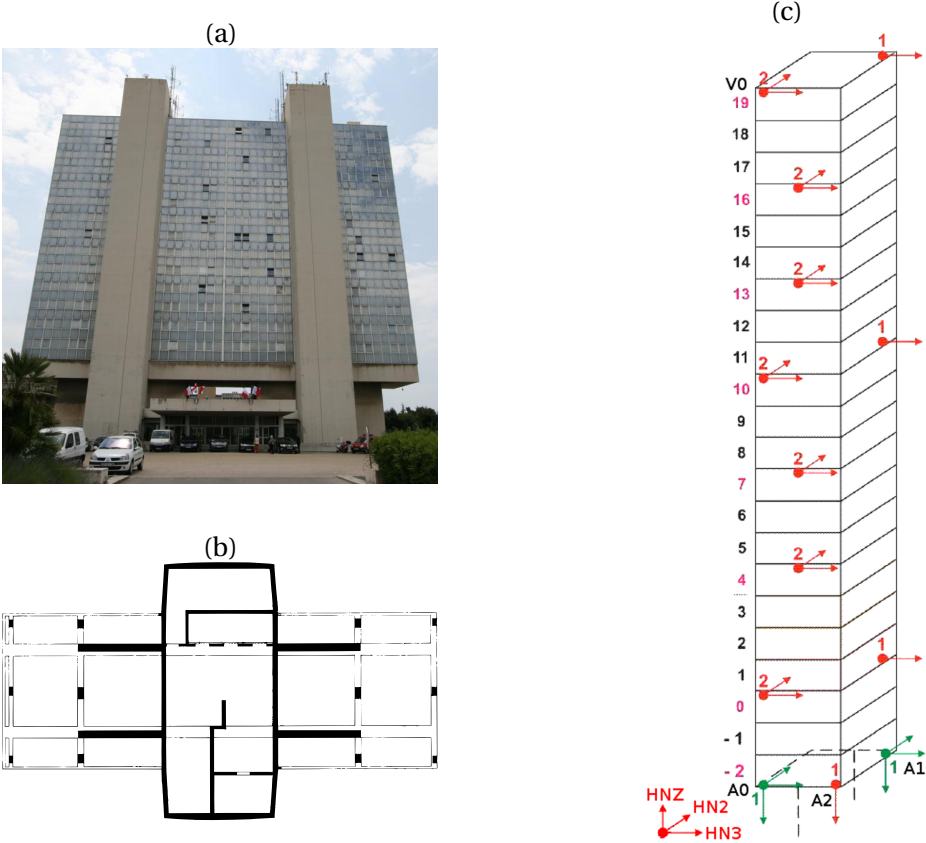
(a) Front view of the Nice prefecture building (CETE, 2010). (b) Horizontal section of the RC tower to which RC shells are connected at each floor and of vertical columns (from structural plans). (c) Distribution of sensors along the instrumented tower. Red and green arrows represent monoaxial and triaxial accelerometers, respectively (CETE, 2010).
